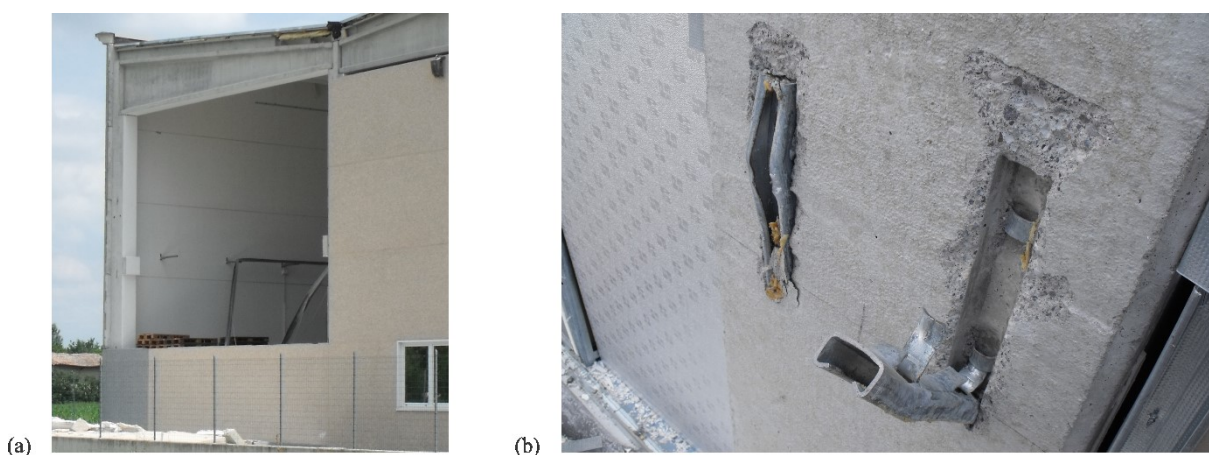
(a) Failure of the horizontal RC cladding panels and (b) the damaged cladding connections during the earthquake in Emilia Romagna
